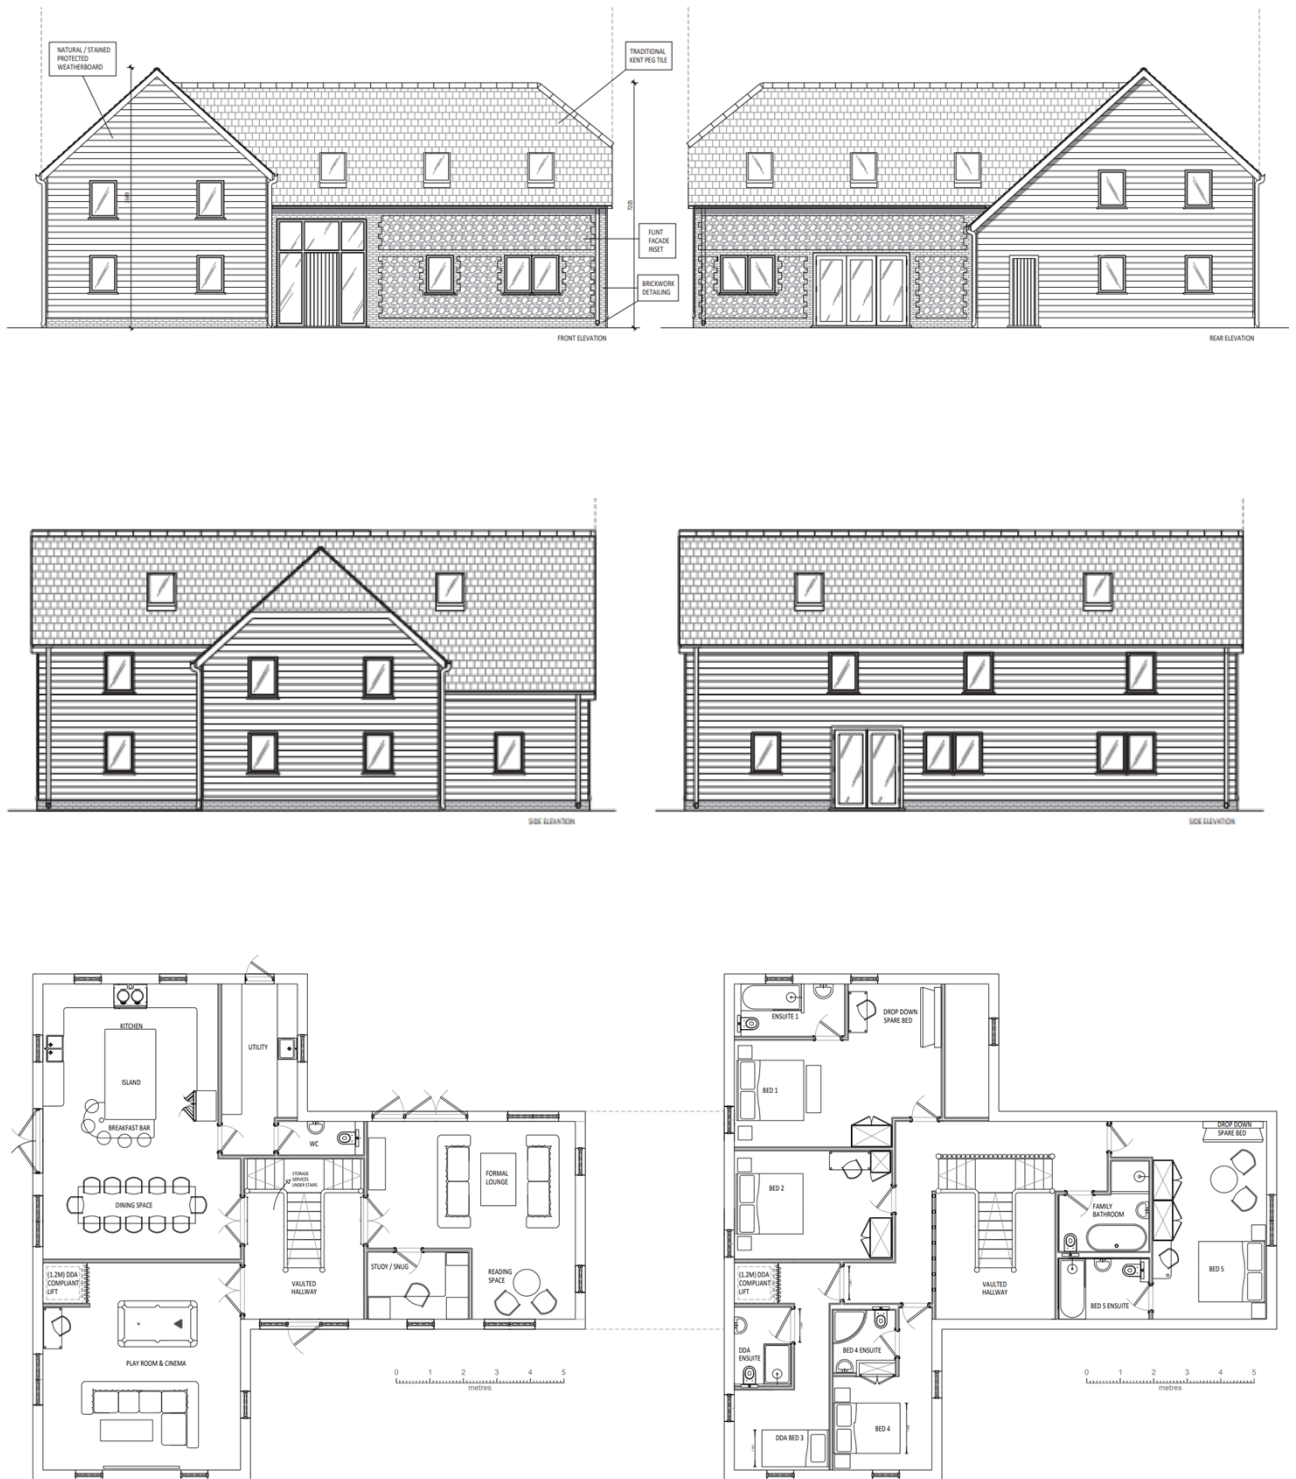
Proposed Elevations and Floor Plans for 'The Barn'
